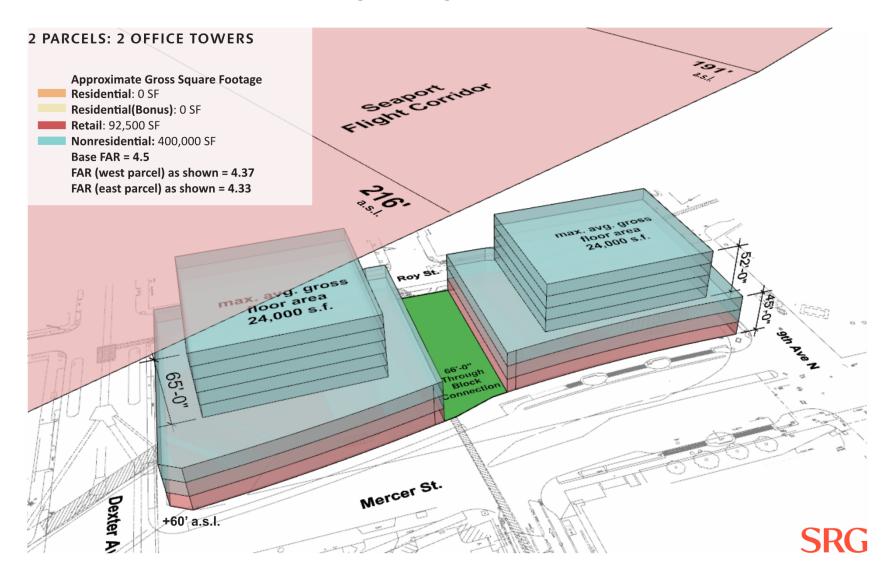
Potential Building Envelope With Existing Zoning (Office)
